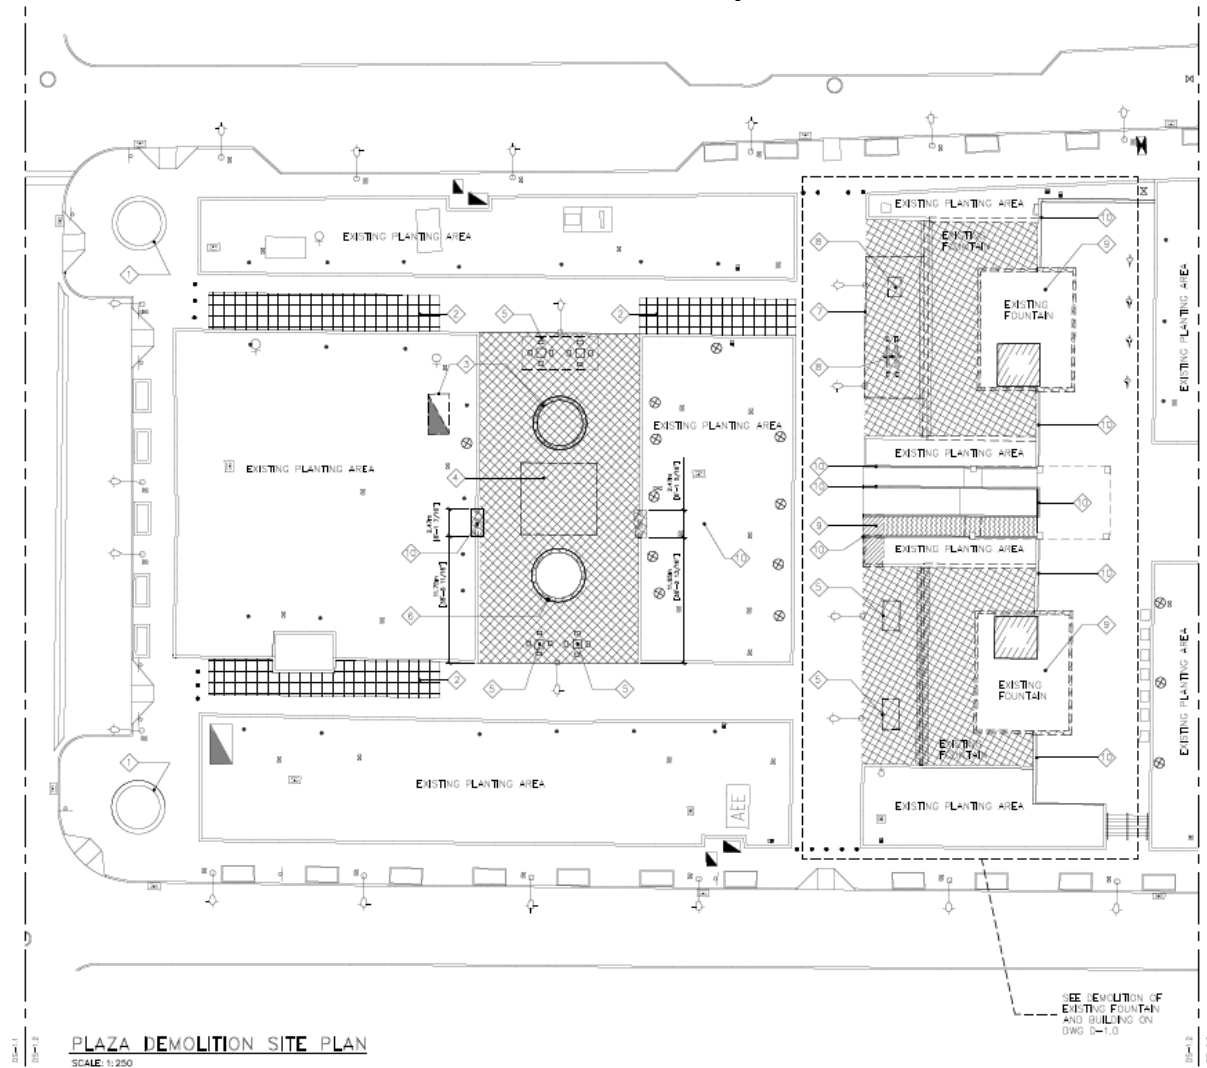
Plaza de la Convalecencia. Demolition site plan. (Source:Source: Drawing DS-1.3, Hernández-Bauzá PSC Architects, 2024)
